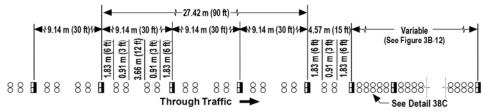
B - Lane Drop Markings at Conventional Highway Intersections
